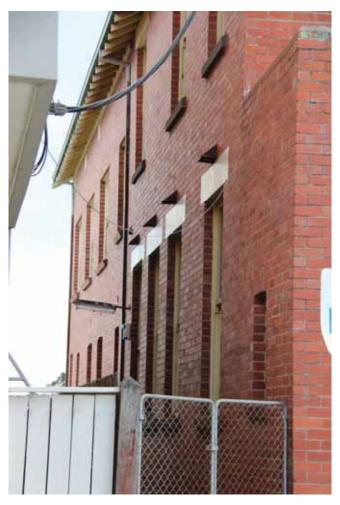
The south elevation. The 1950s addition to the first floor was built with wide eaves with exposed rafter ends, like the original 1913 section.
